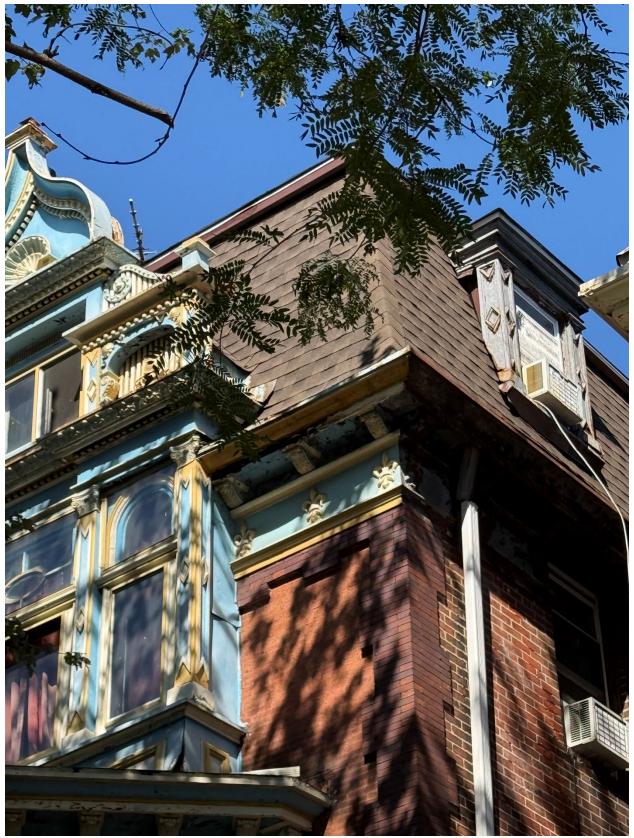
4221 Pine Street with new shingles installed, November 2025.
